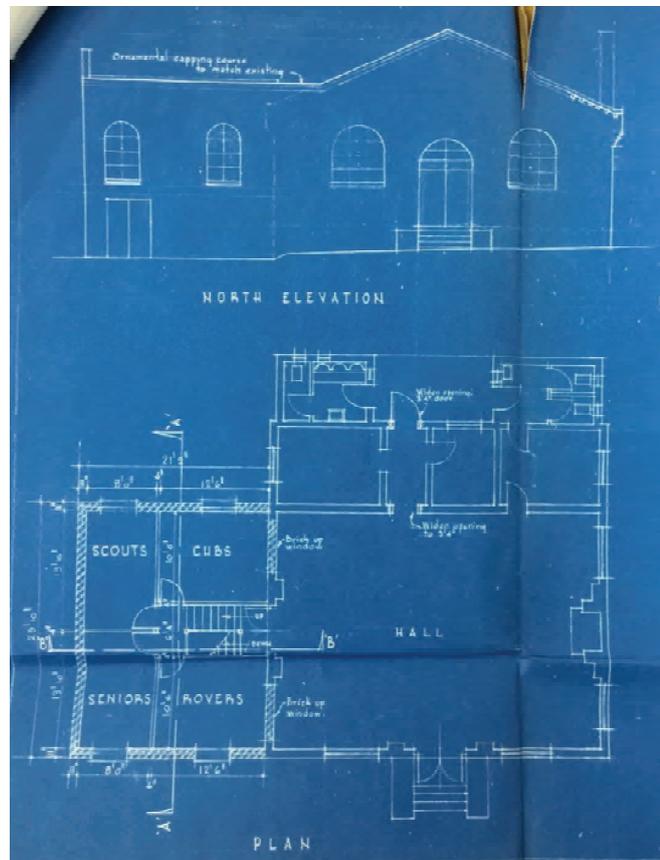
Best Overend Architect, Plan of Deepdene Scout Hall, c.1952, showing proposed alterations to the building. (Source: Public Building file, PROV)
